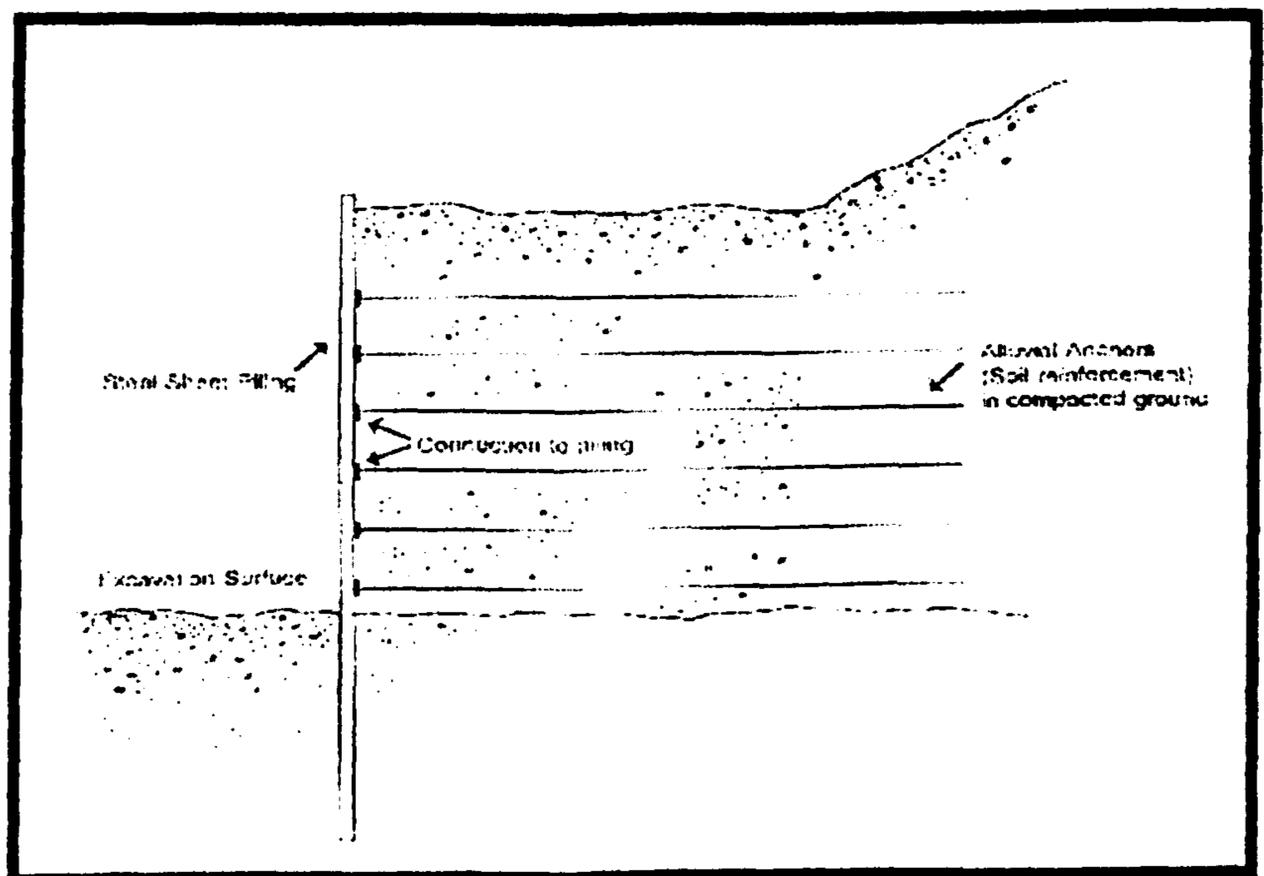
Shown about the excavation by using sheet pile to support the wall
